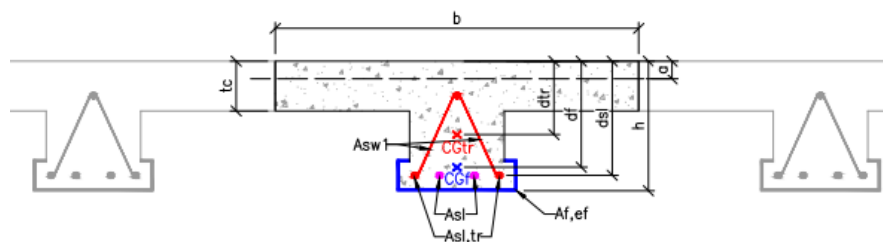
Cross-section of composite ribbed slab with additional rebar.
